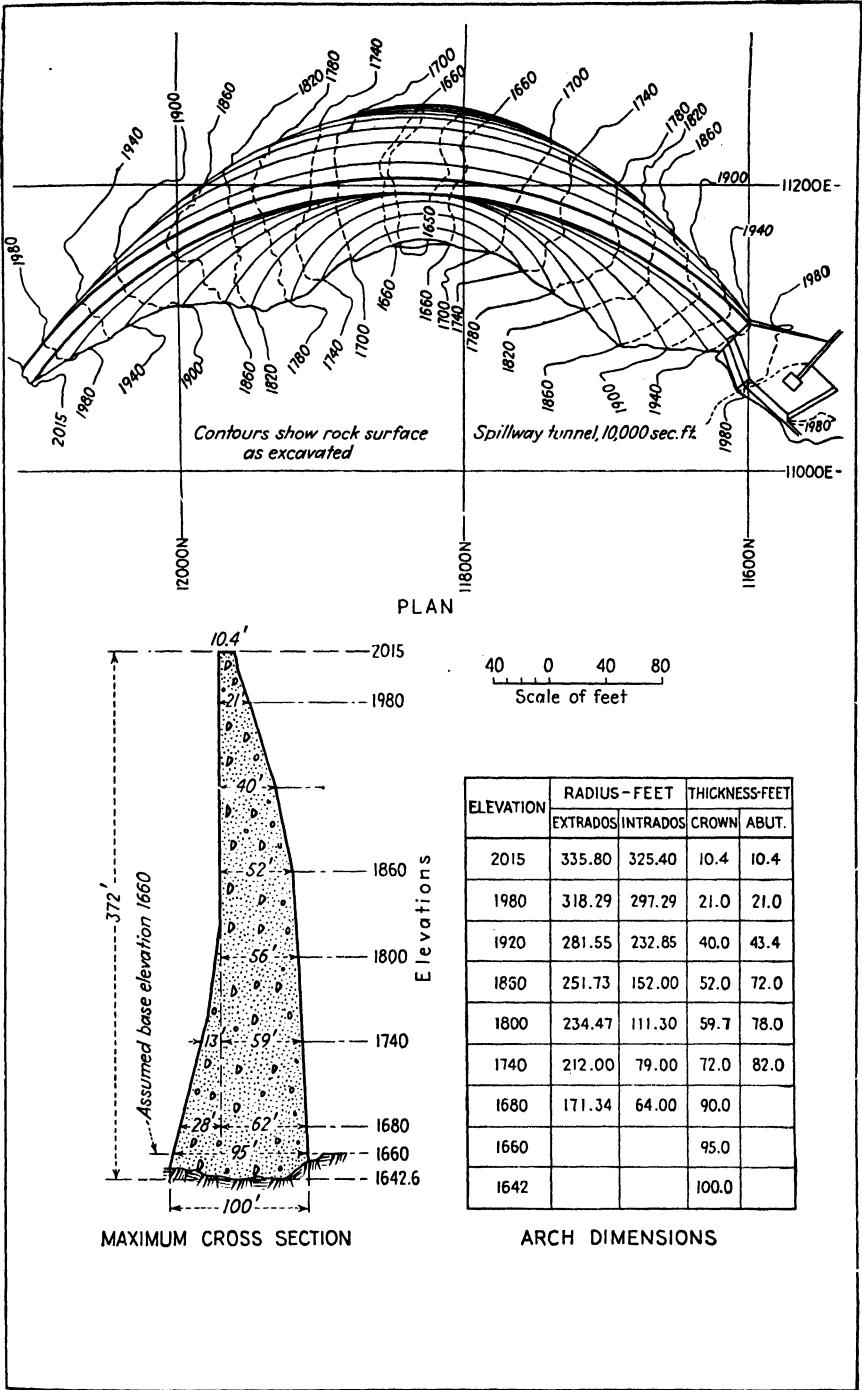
Plan, sections, and dimensions of Pacoima Dam.
